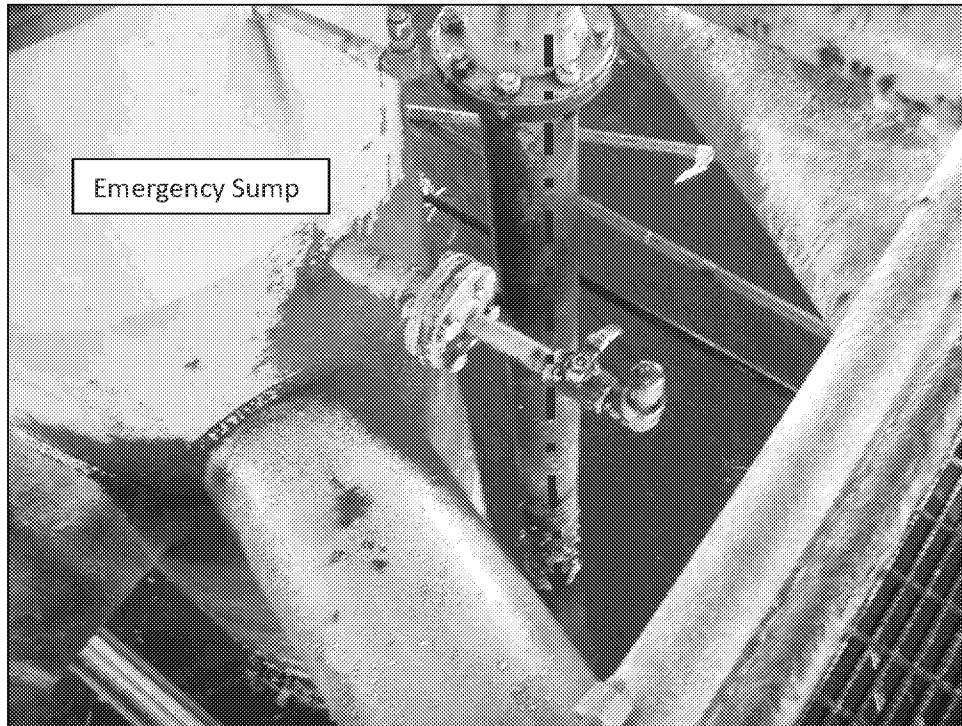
Open-bottomed Emergency Sump and pipe leading from tank S-03 entering the Pacific Ocean. P&IDs indicate that the pipe connects with the sump at -120 feet and the open-bottom of the sump is at -177 feet.
